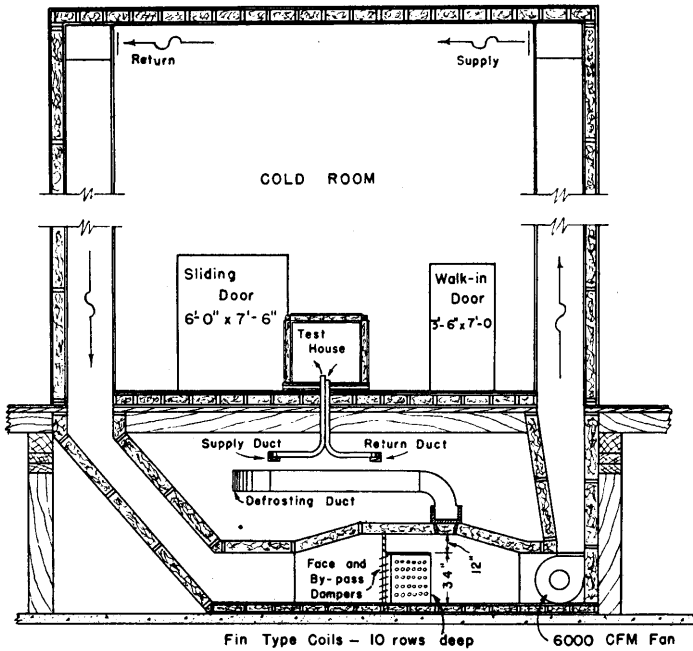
SECTIONAL VIEW THROUGH COLD ROOM AND COOLING UNIT
